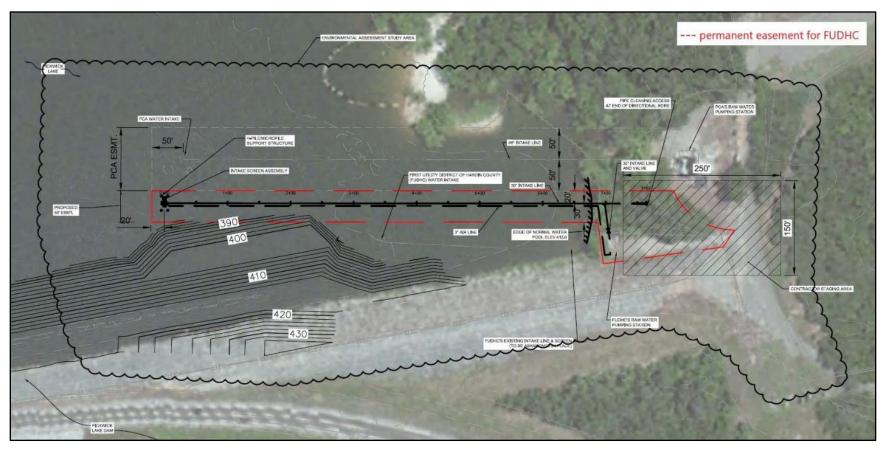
Aerial view of APE. Note proposed intake line between existing lines to the north and south.
